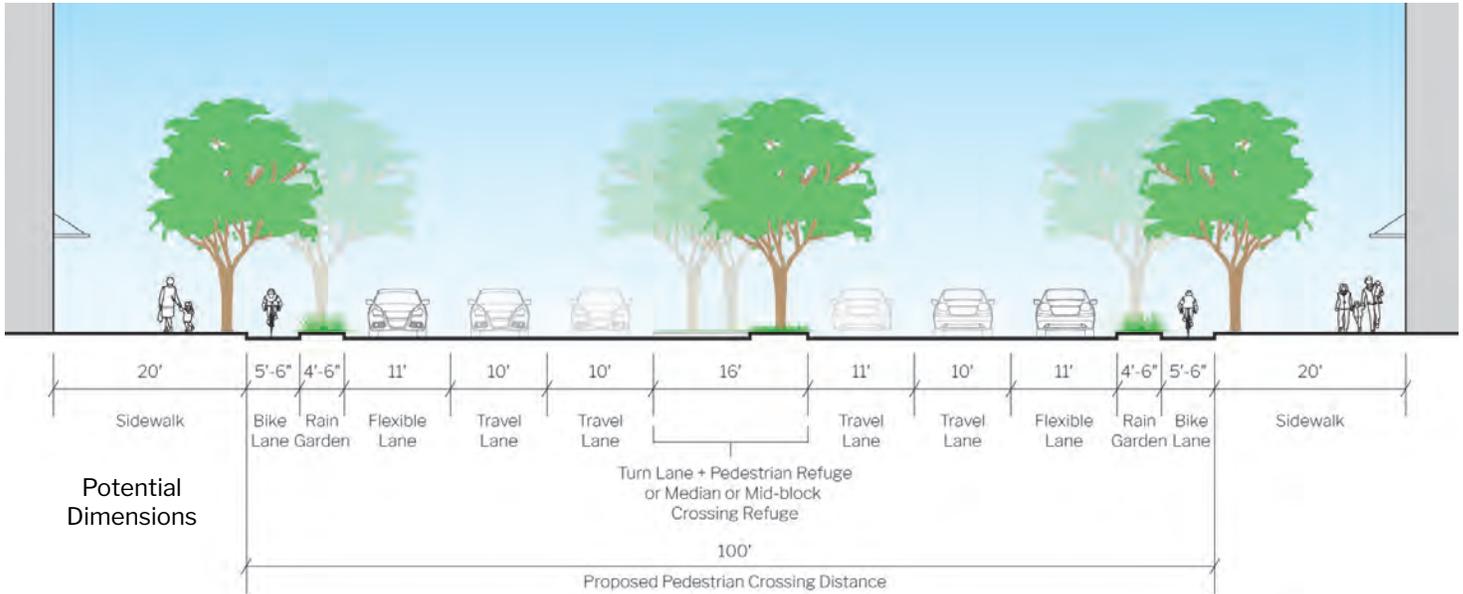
WINCHESTER BOULEVARD CONCEPT - 80 FOOT CURB-TO-CURB - PROPOSED STREET SECTION
